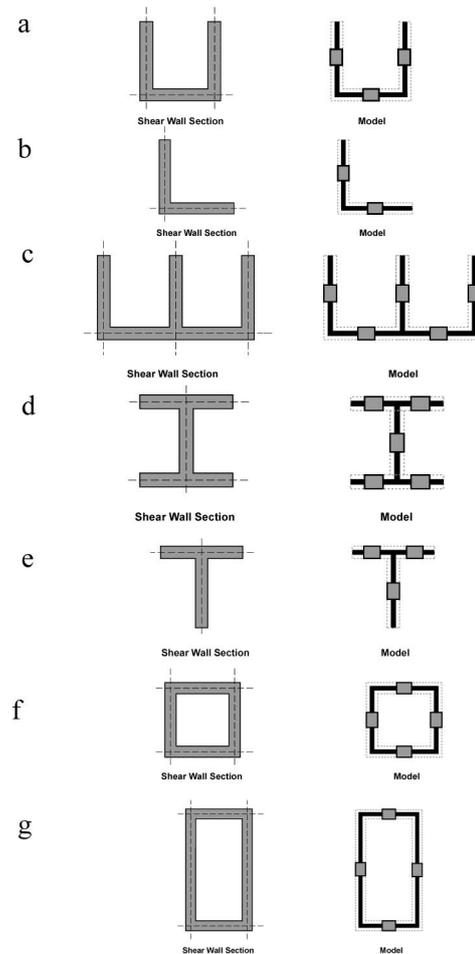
Plans and Proposed Models of (a) U, (b) L, (c) W, (d) H, (e) T, (f) Square, and (g) Rectangular Shear Wall Assemblies
